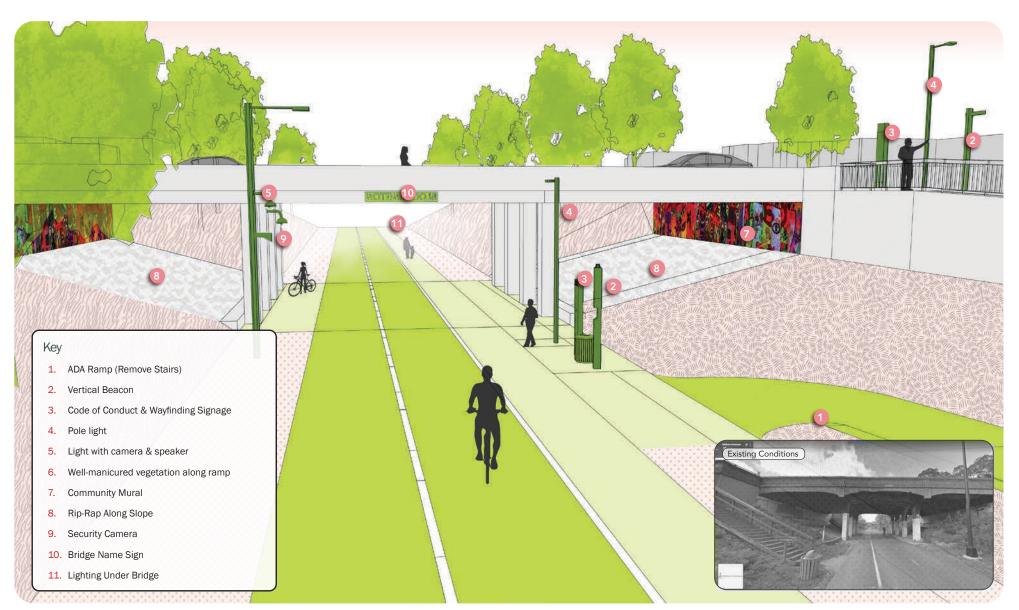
Recommendation at Bloomington Staircase | Diagram of view under the bridge
